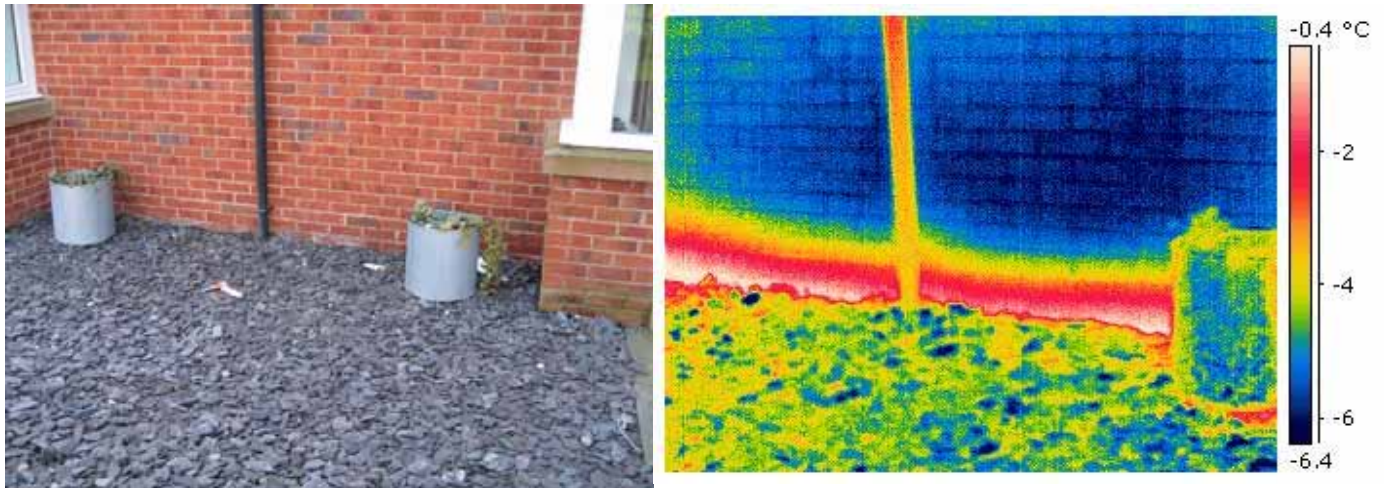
Heat Loss at Junction between External Wall and Ground Floor - Bryant Plot 13
